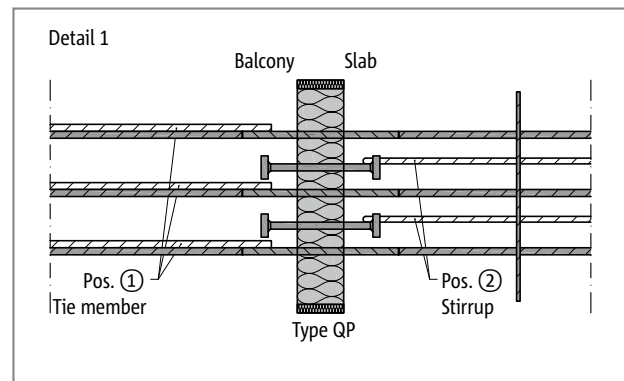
Schöck Isokorb® T type Q-P: Detail 1; Reinforcement connection tie bar
